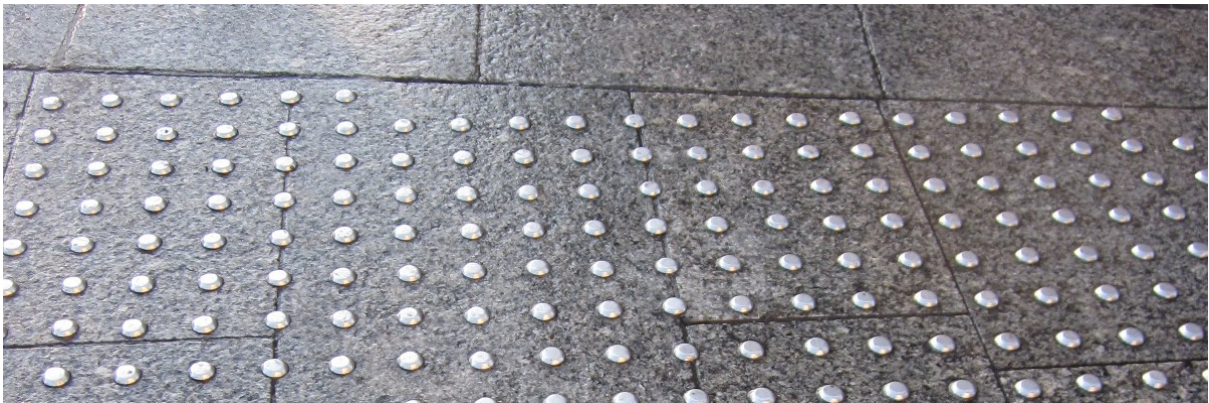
Detail of metal tactile paving used on O'Connell Street
